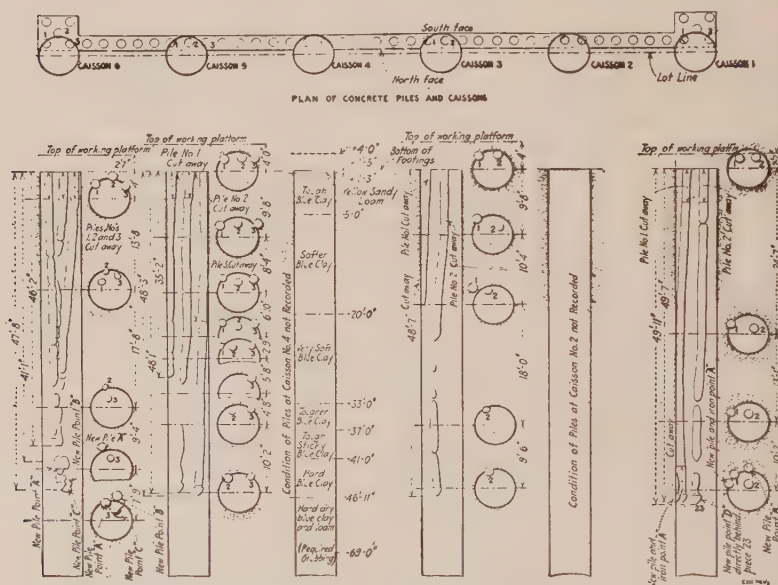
CONDITION OF BUILT-IN-PLACE PILES DISCLOSED BY EXCAVATION.
